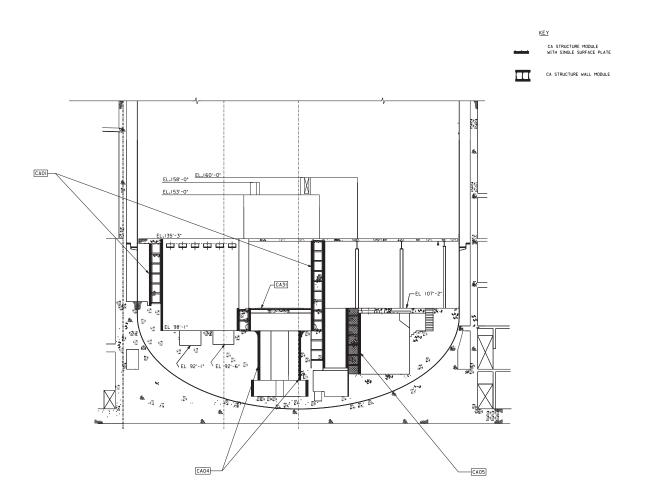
(Sheet 6 of 7) [Structural Modules in Containment Internal Structures]\
